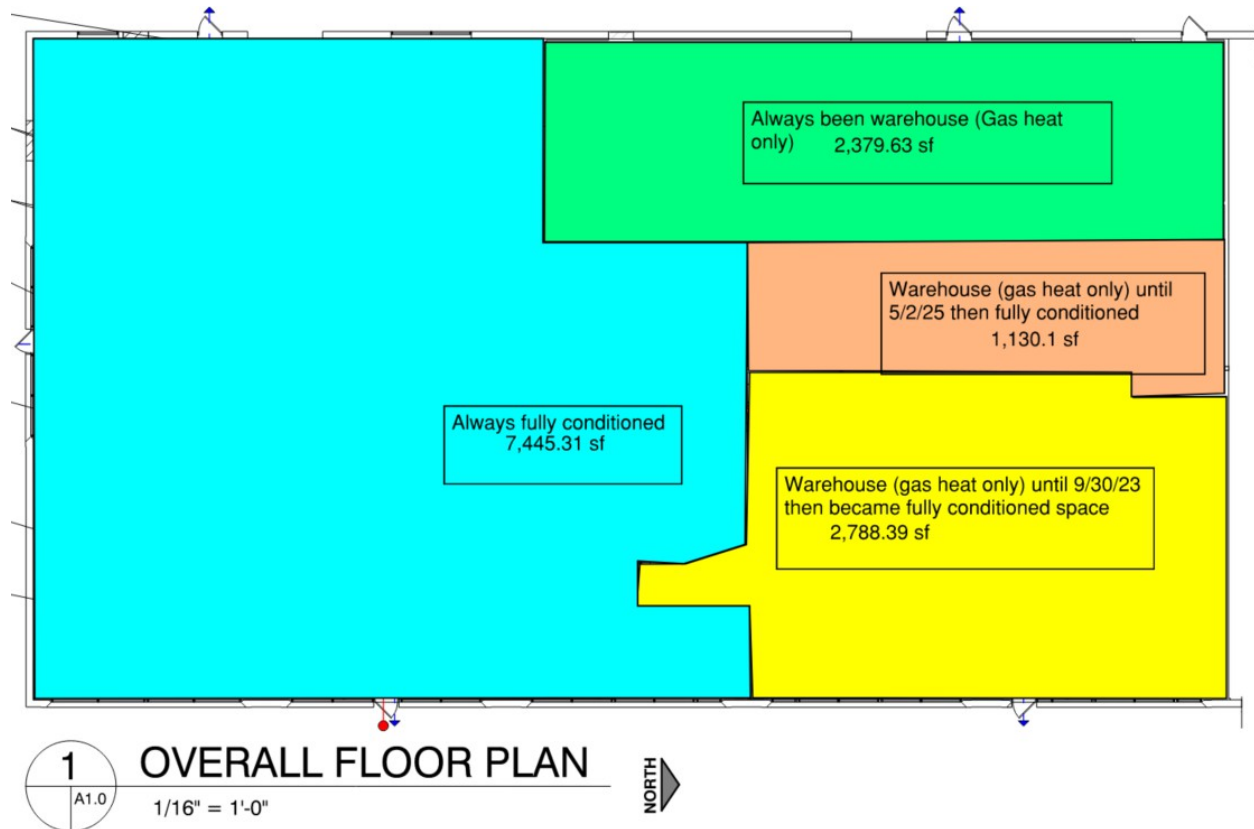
FLOOR PLAN CONDITIONED SPACES
